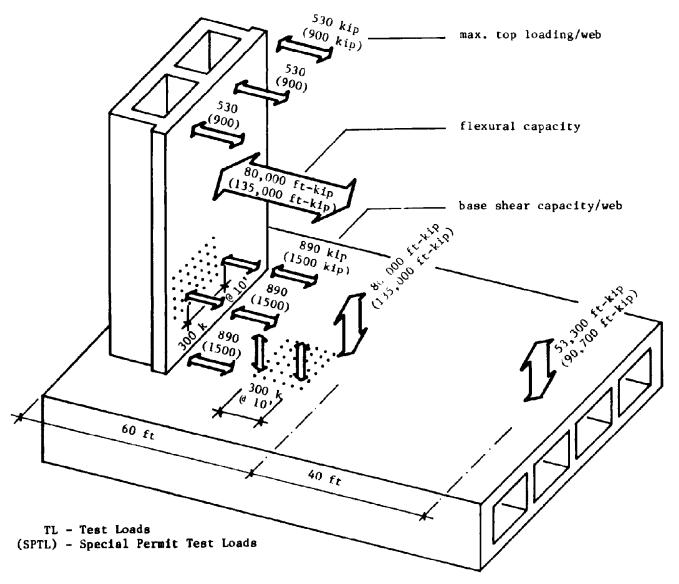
Reaction Wall and Test Floor Capacity Overview
